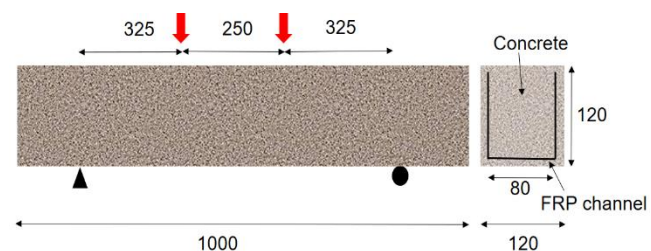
Four-point bending test arrangement and cross section geometry of the beam
